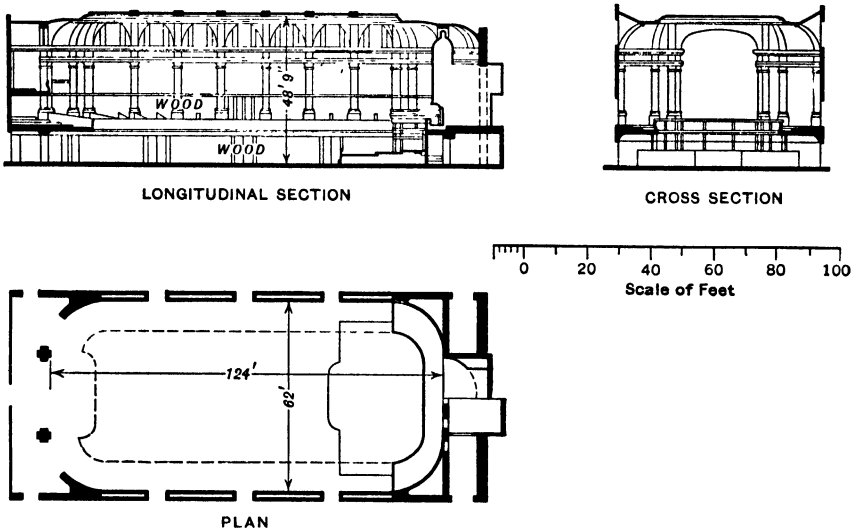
Plan and sections for the Leipzig Gewandhaus.
